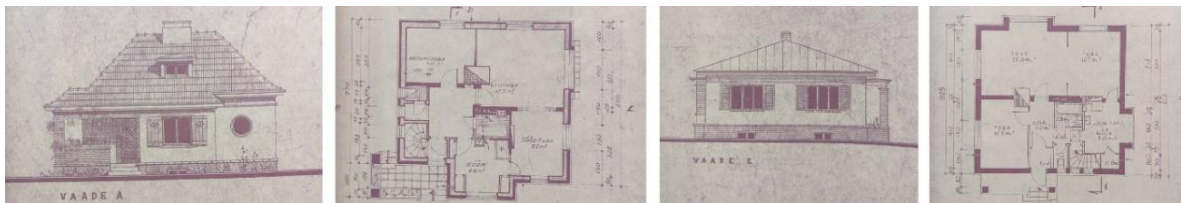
Examples of bungalow dwellings from 1956 (left to right: project 34 with elevation and ground floor; project 35 with elevation and ground floor) (RPI Estongiprogorstroj, 1956)
